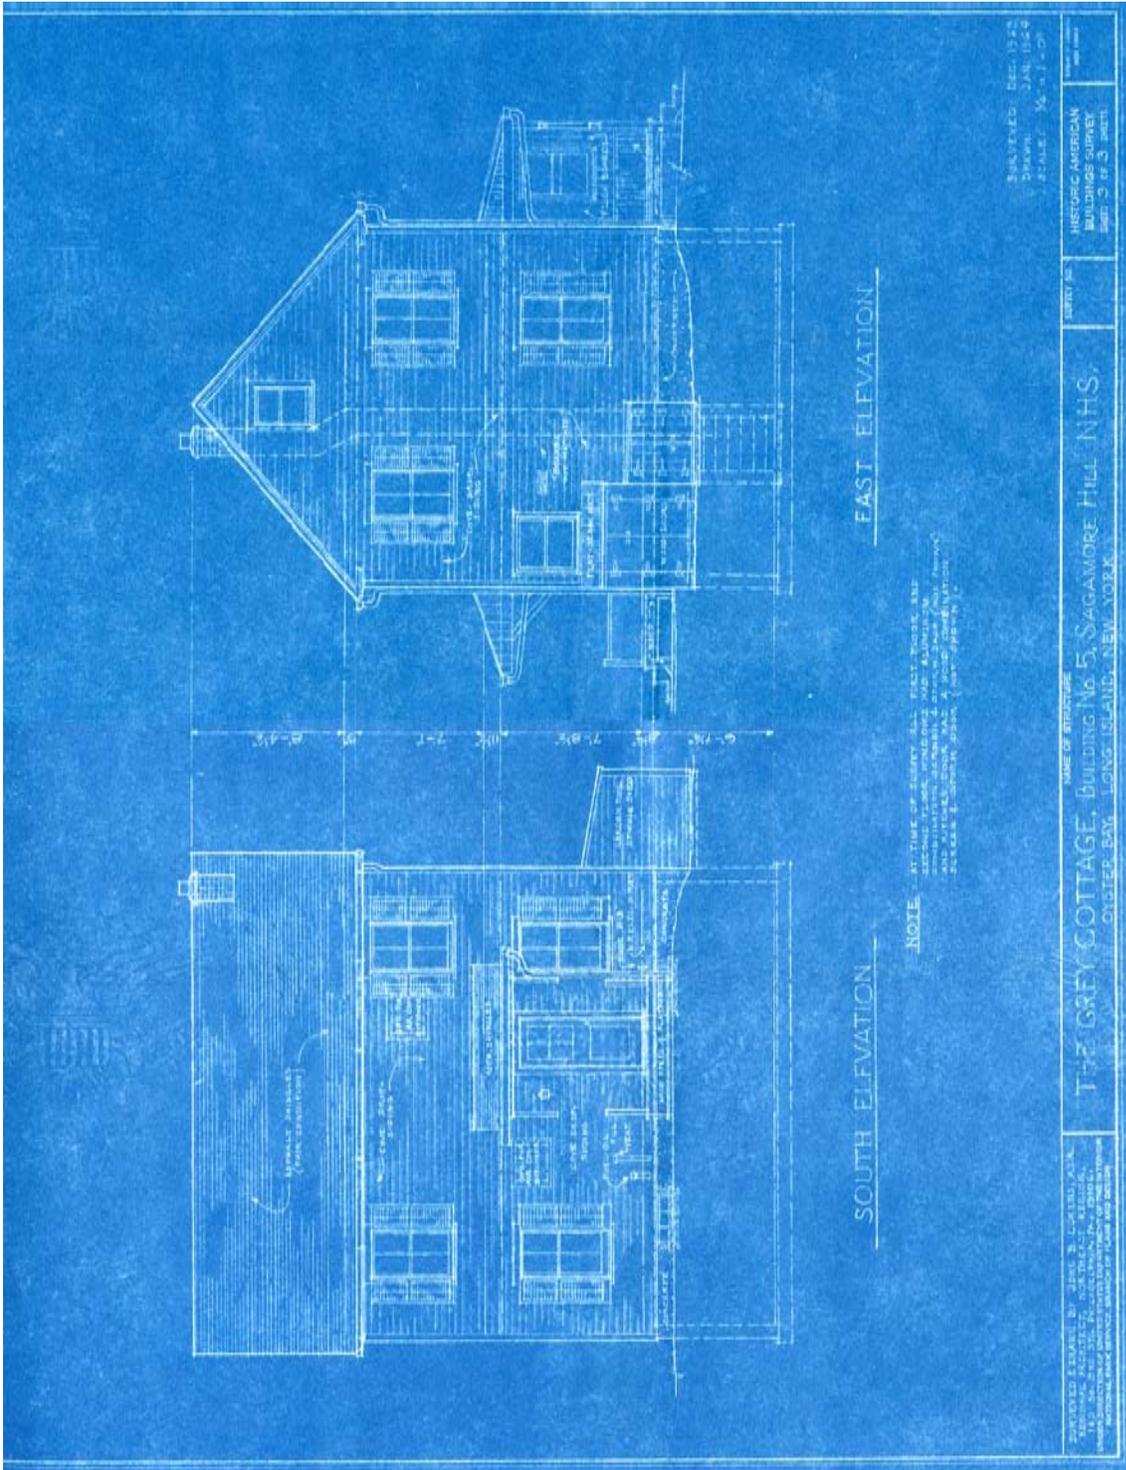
The Grey Cottage, Building No. 5, Sagamore Hill NHS, Historic American Buildings Survey, Sheet 3 of 3 sheets. Reproduced from full-size blueprint; not to scale.
